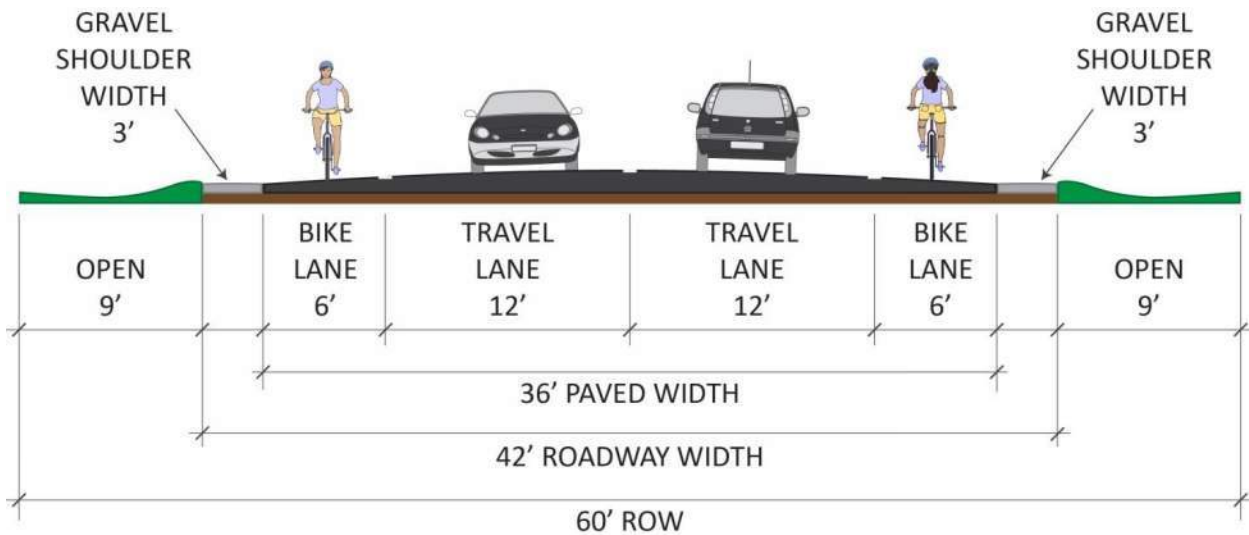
Paved County Roads with Bike Lanes (Collector or Local Roads)
